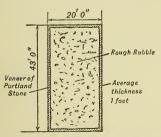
HORIZONTAL SECTION OF PIER 10 FT. ABOVE FLOOR OF CRYPT.
